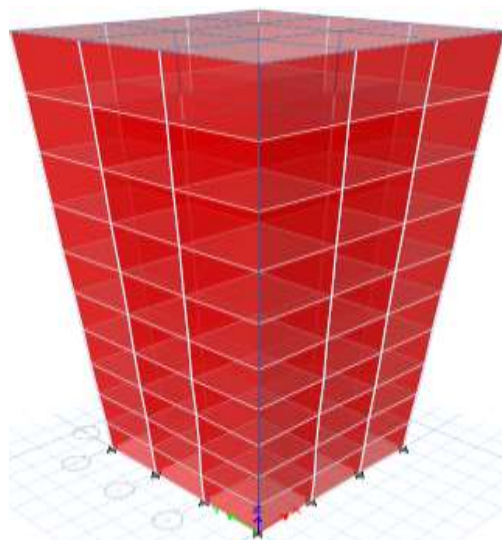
3D View of Empty Elevated Compositd Water tank
